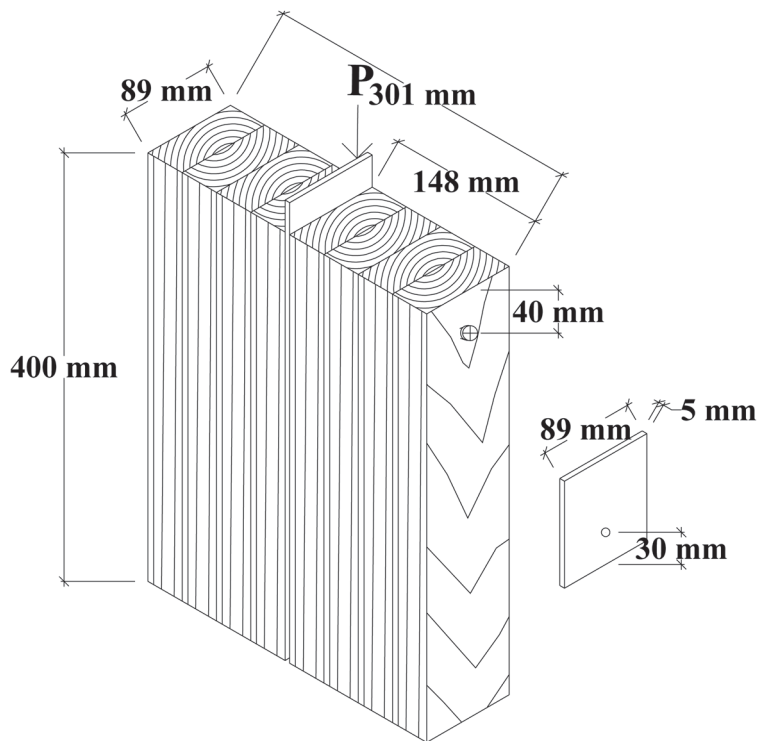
Shearing test of a glulam member assembly with an aluminum connector with pressure (P) applied parallel to the grain.
